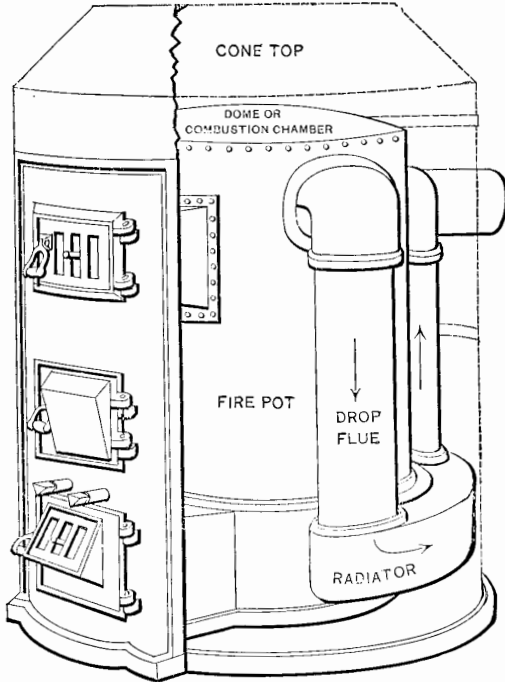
Steel Plate, Brick Lined, Indirect Draft Furnace.
